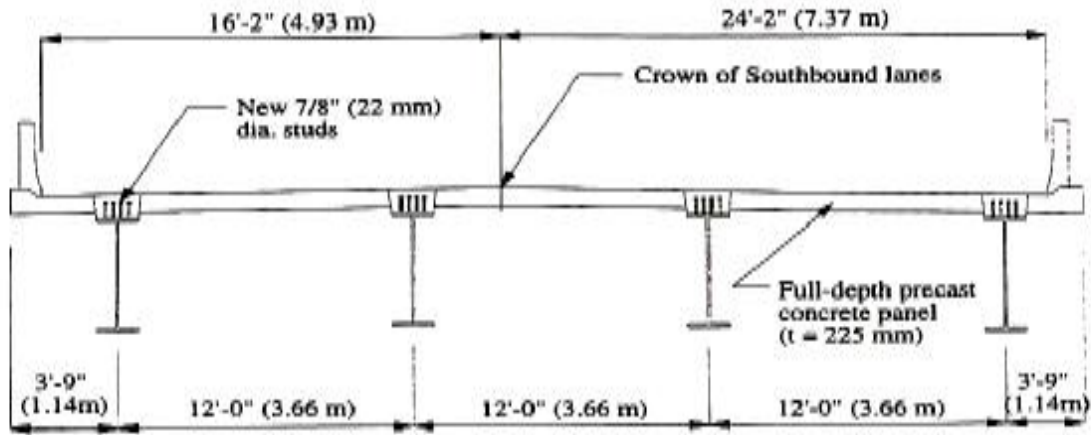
Typical cross section of the Queen Elizabeth Way-Welland River Bridge
